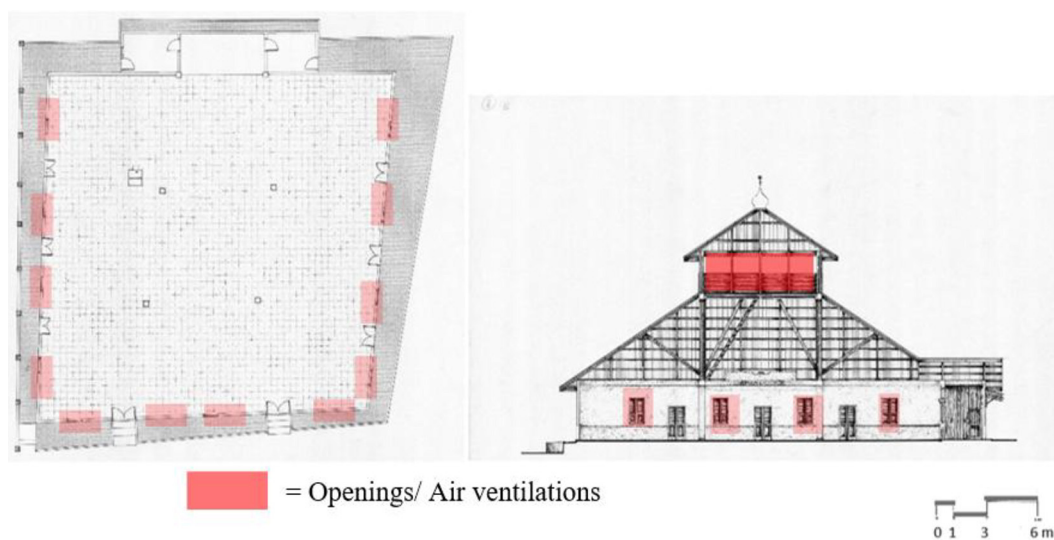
(M3) Al Jihad mosque (floor plan, vertical section, and ventilation shown in pink)
